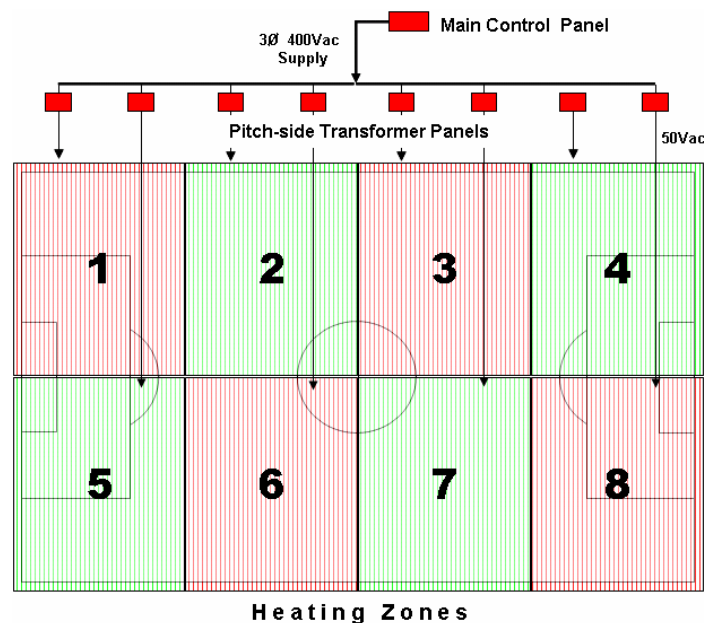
Typical arrangement of an Inditherm pitch heating system
